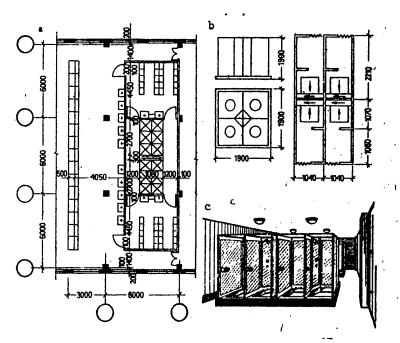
Example solution and equipment for a shower room a -- located in the hall type coat room; b -- sectional shower stalls; c -- general view of the shower
